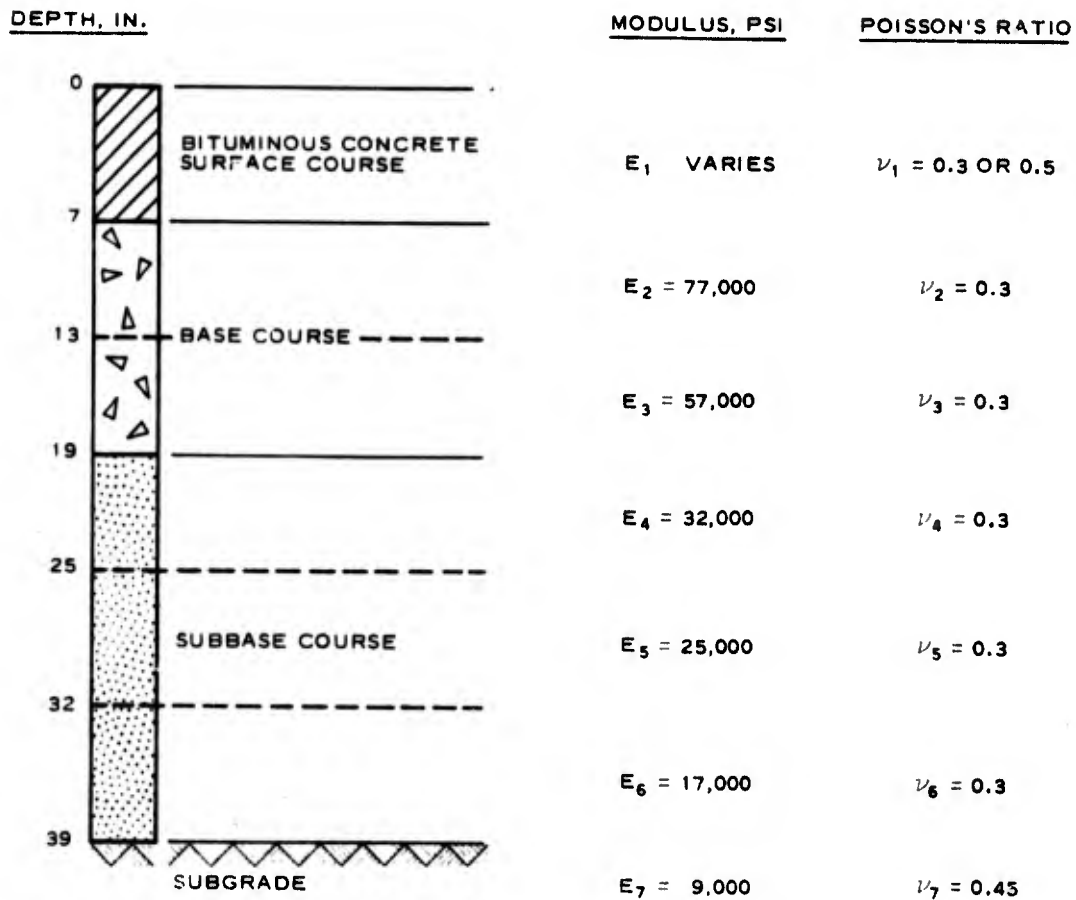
Estimated 39-in. conventional flexible pavement section with 7-in. bituminous concrete surface course
